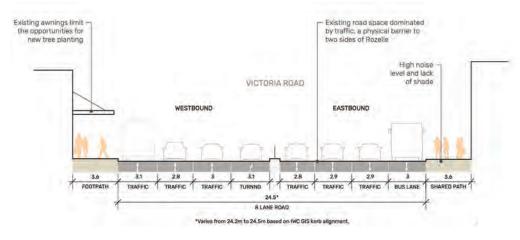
Victoria Road Section (1:200) Typical Existing Configuration
